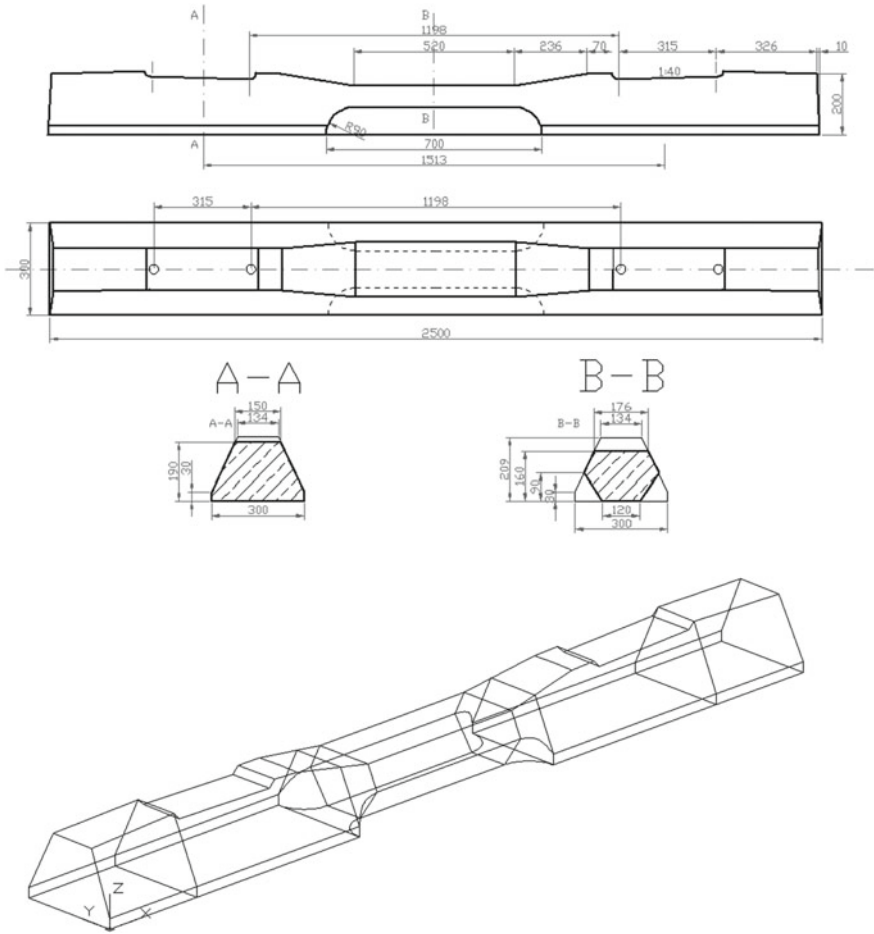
Schematics of concrete railway sleepers (e.g. INBK-7) and their dimensions
